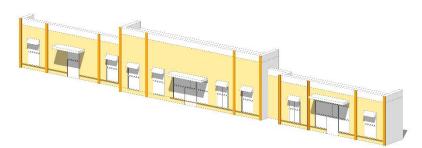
Outlot/Liner Commercial Building Type Articulation
